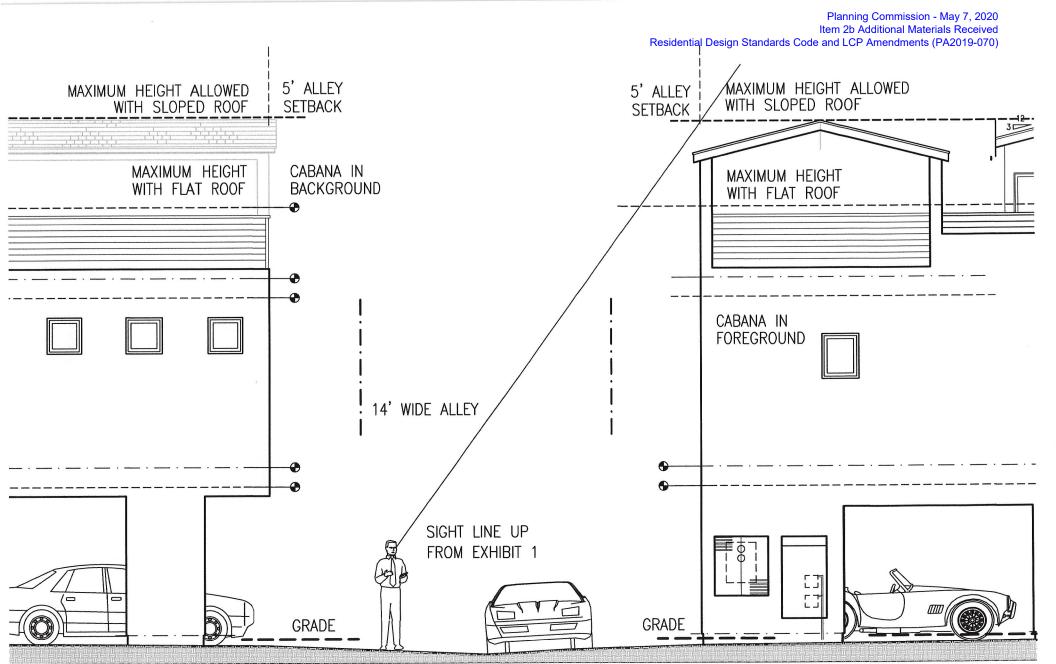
LIMIT PLATE HEIGHT SIDE ELEVATION 3/16"
